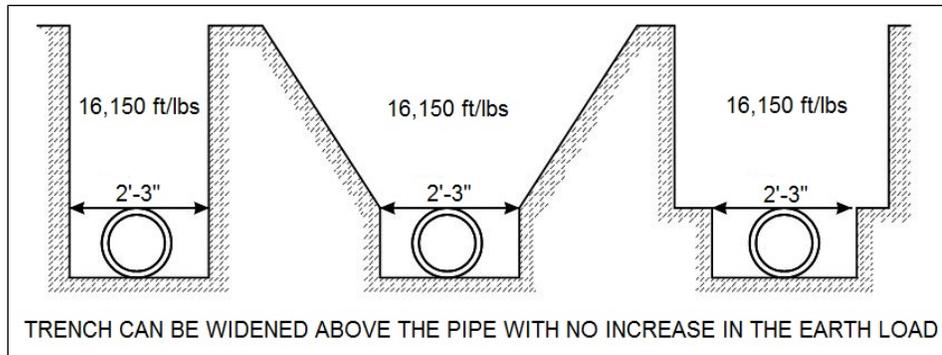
6: Trench Widening Parameters with Widening above Pipe
